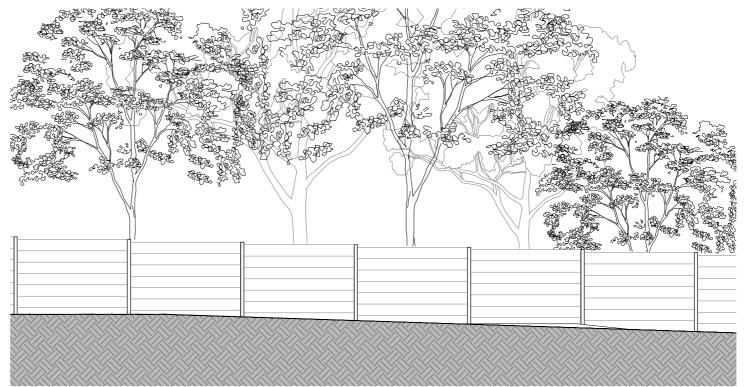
Proposed Noise Wall Design: Elevation - Railway Side
